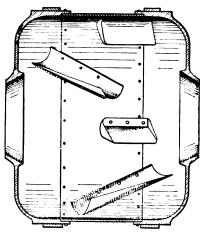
Mixing Chamber of Drum Type Concrete Mixer.
